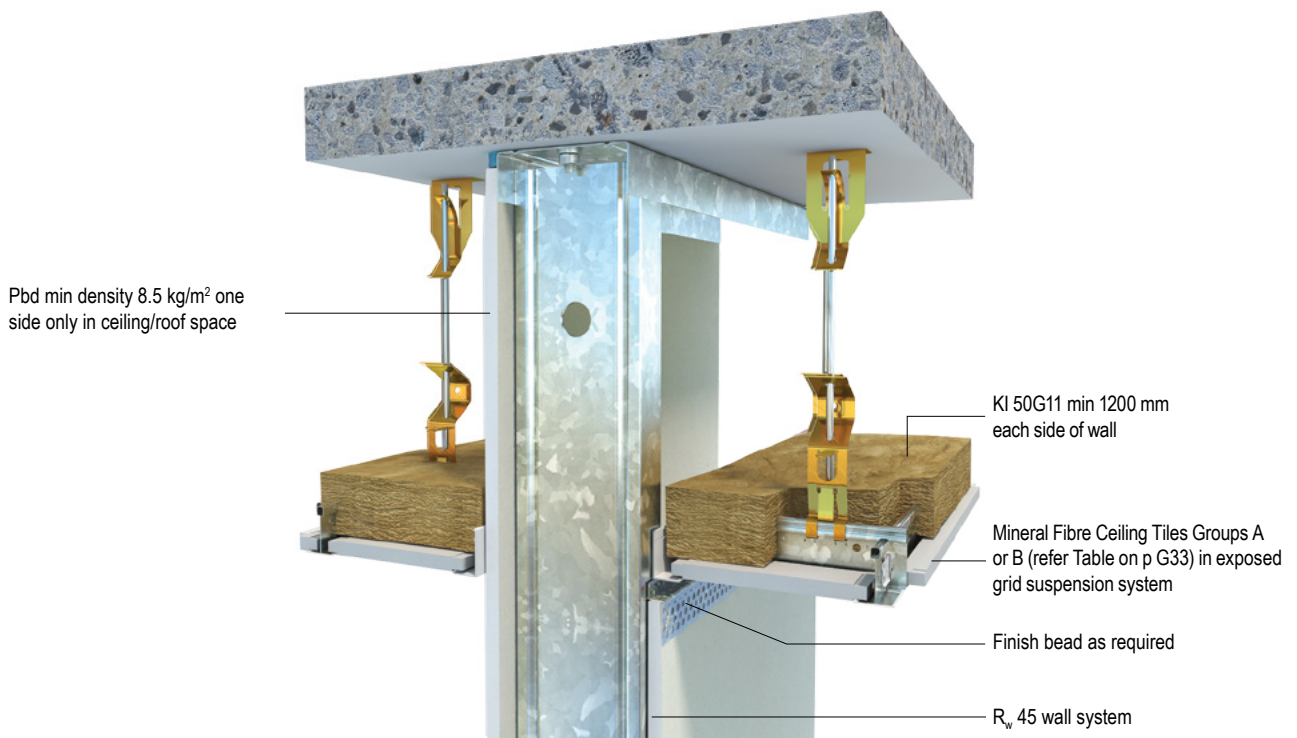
Ceiling configuration to maintain an R_w 45 wall acoustic rating
